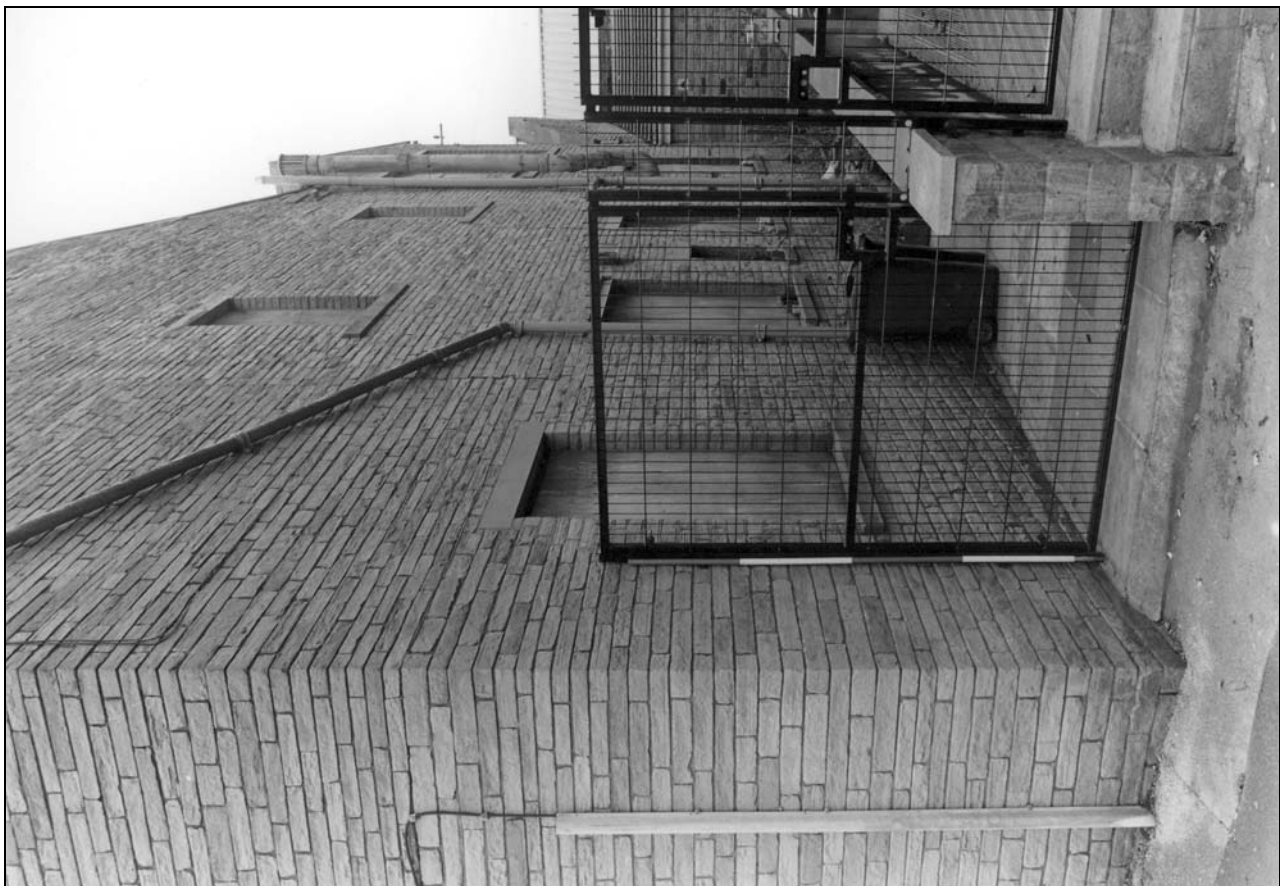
East end of two storey block, from the south-east (film 1, frame 7)
